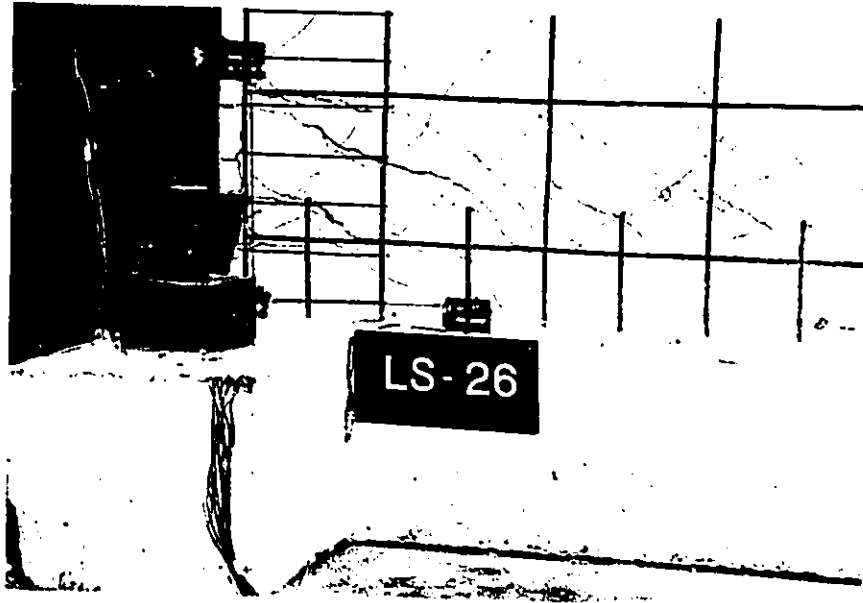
Bottom portion of Wall 6 at $4\Delta_y$
